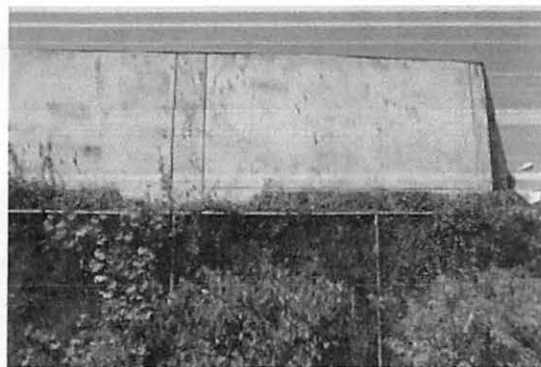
Clipped southeast corner façade with scored concrete cladding, facing northwest.
